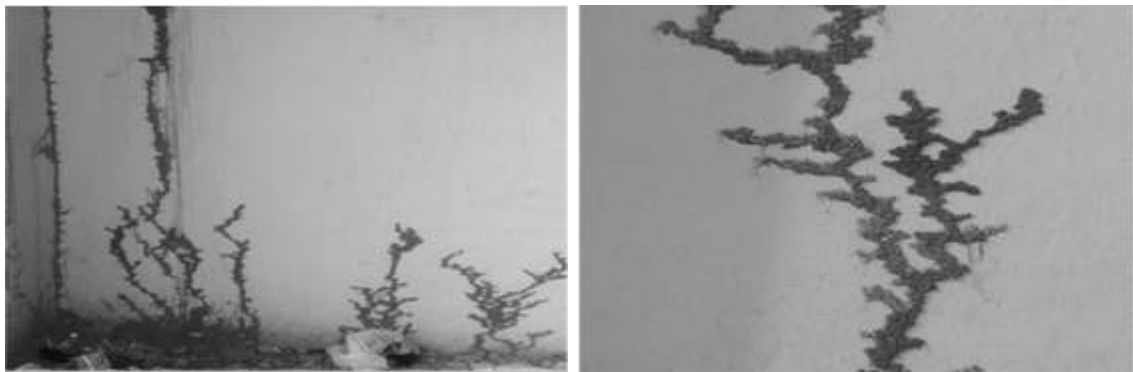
The Vulnerability of the Intersection of Floor to Wall of the Hostel Buildings
